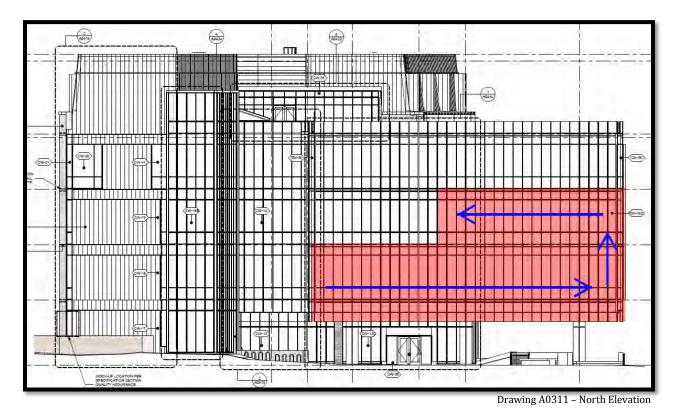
Installation Sequence of Typical Curtain Wall Panels
